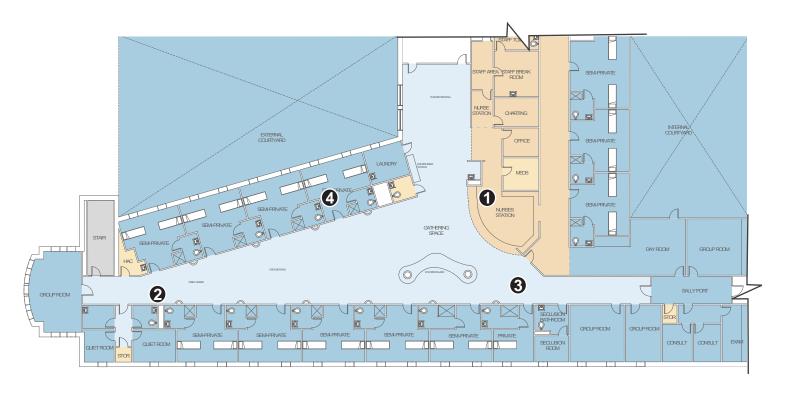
Sun Behavioral Kentucky, Floor Plan
